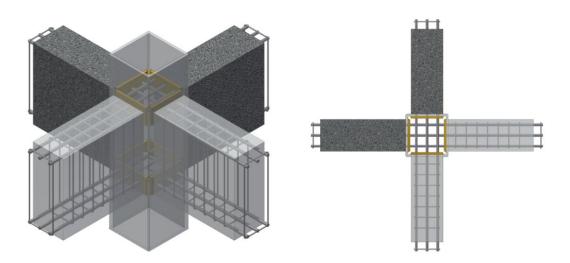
Moment connection between concrete beam and concrete filled steel tubular column with through reinforcements
